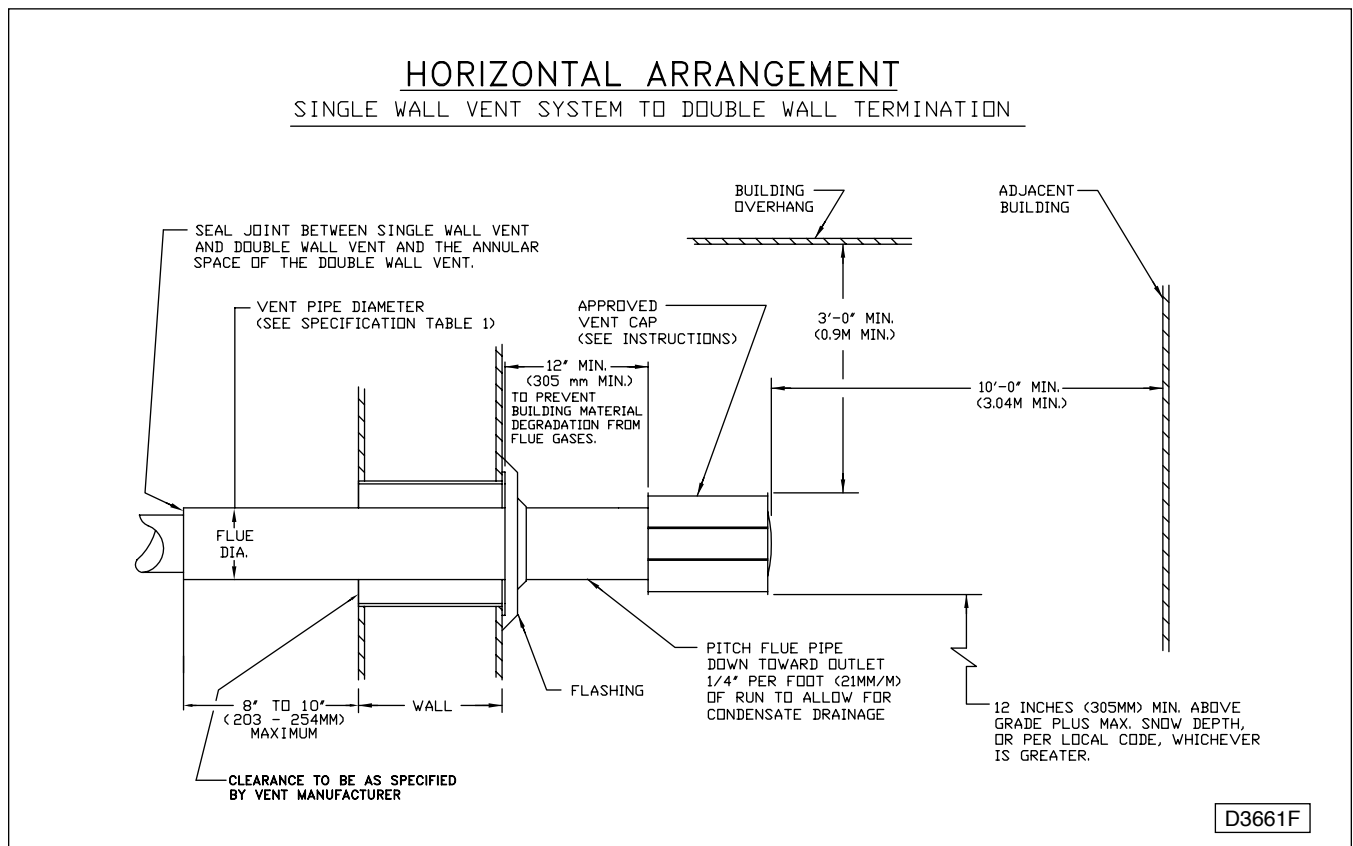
B - Horizontal Arrangement, Single Wall Vent System to Double Wall Termination
